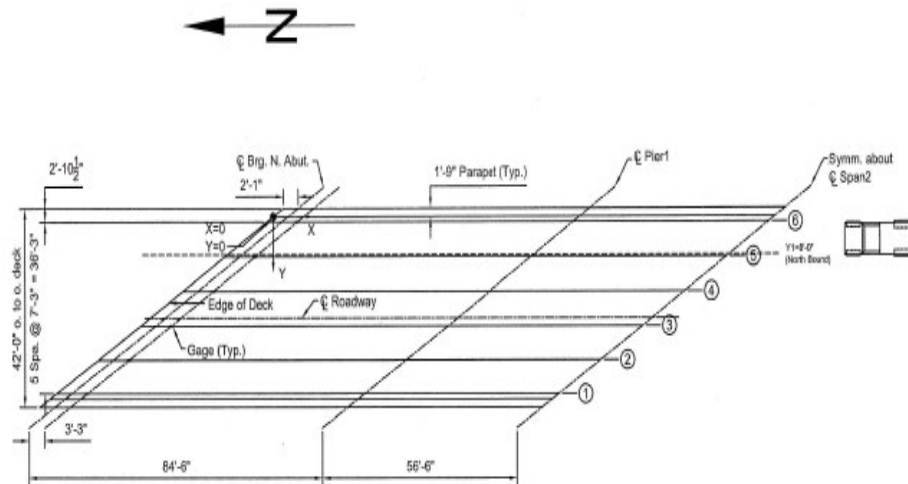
Bridge No 068-0046 plan (Cross et al., 2006)
